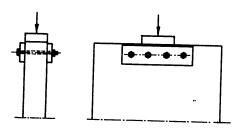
Local Reinforcement Consisting of Steel Plates Secured with Bolts to Both Sides of the Concrete Panel
